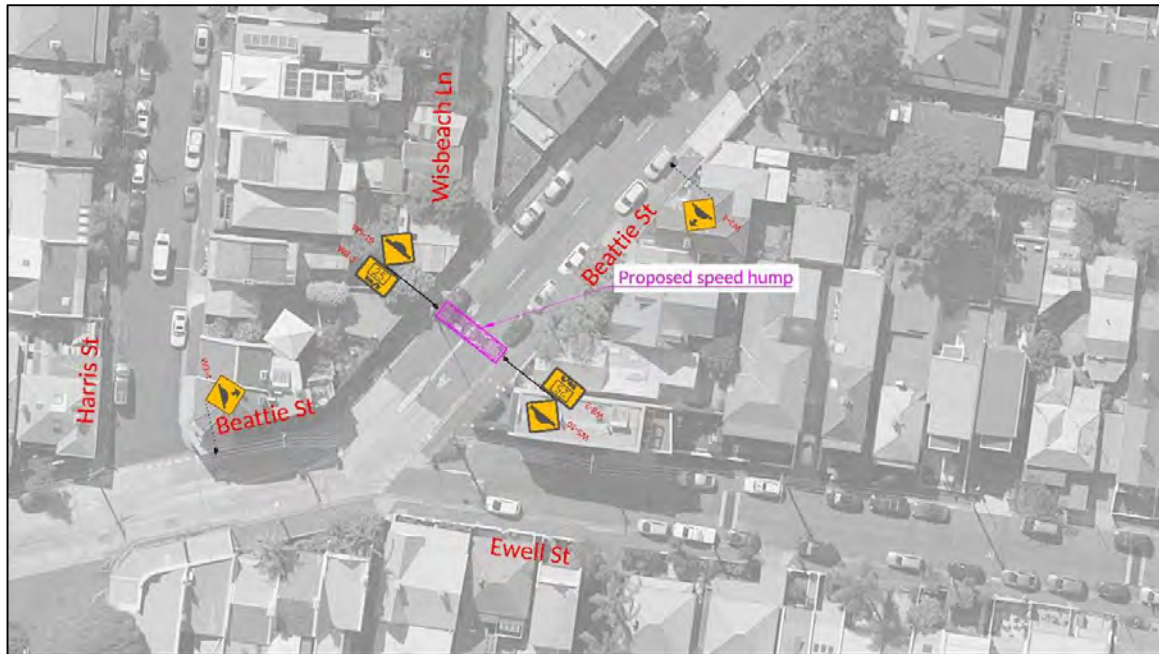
Beattie Street between Ewell Street and Wisbeach Lane proposal.
